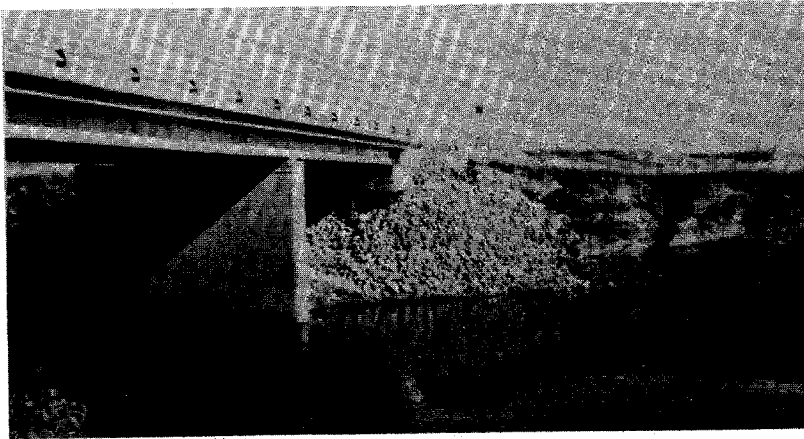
Bank erosion at upstream side of right abutment, south bridge of PH-11. (From Saskatchewan Dept. of Highways and Transportation.)
